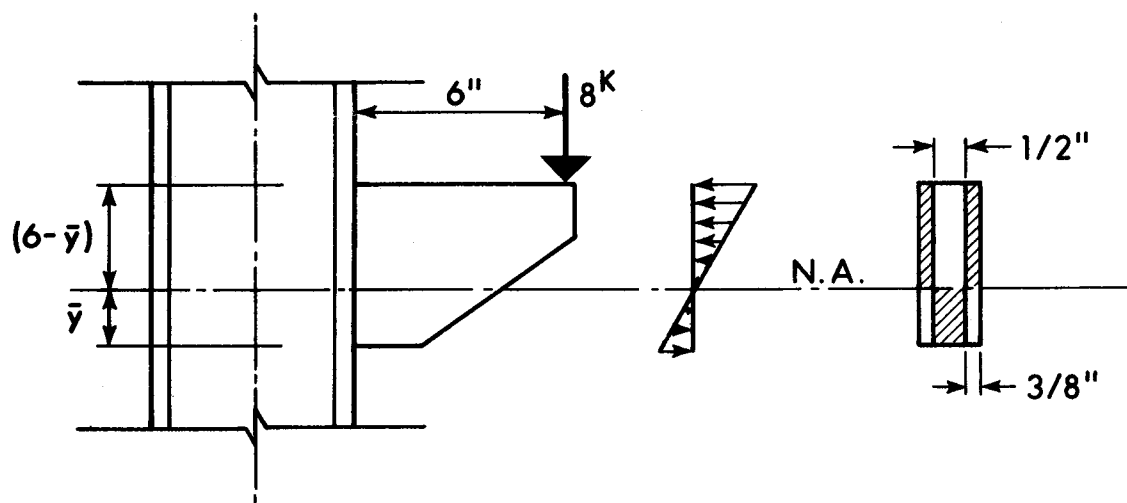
DESIGN EXAMPLE (METHOD 2)
